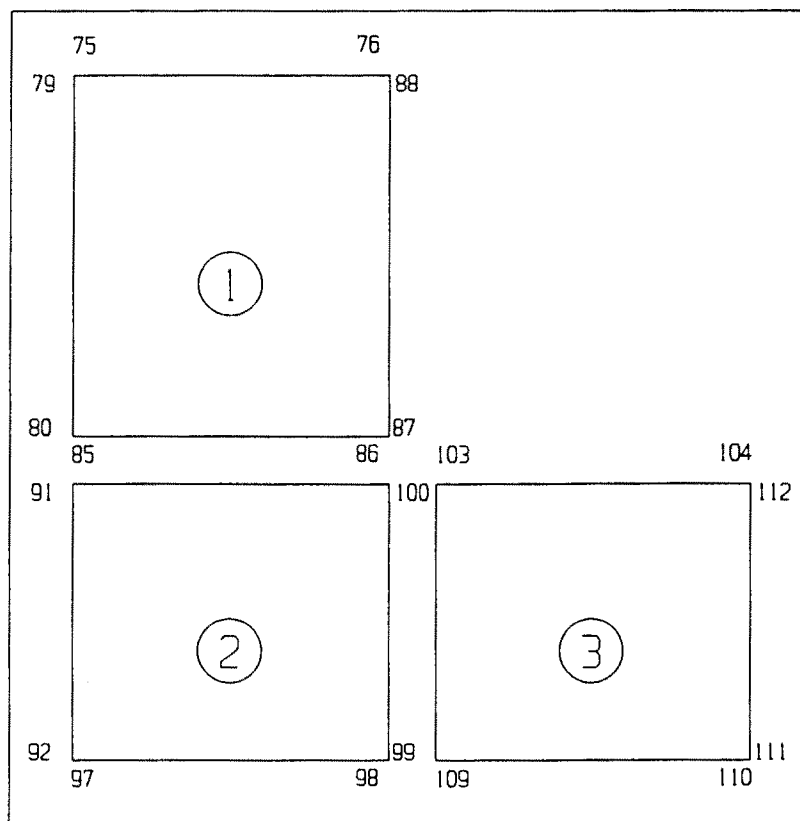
A-21 CALLAWAY CASK LOADING POOL BOTTOM SPRINGS
